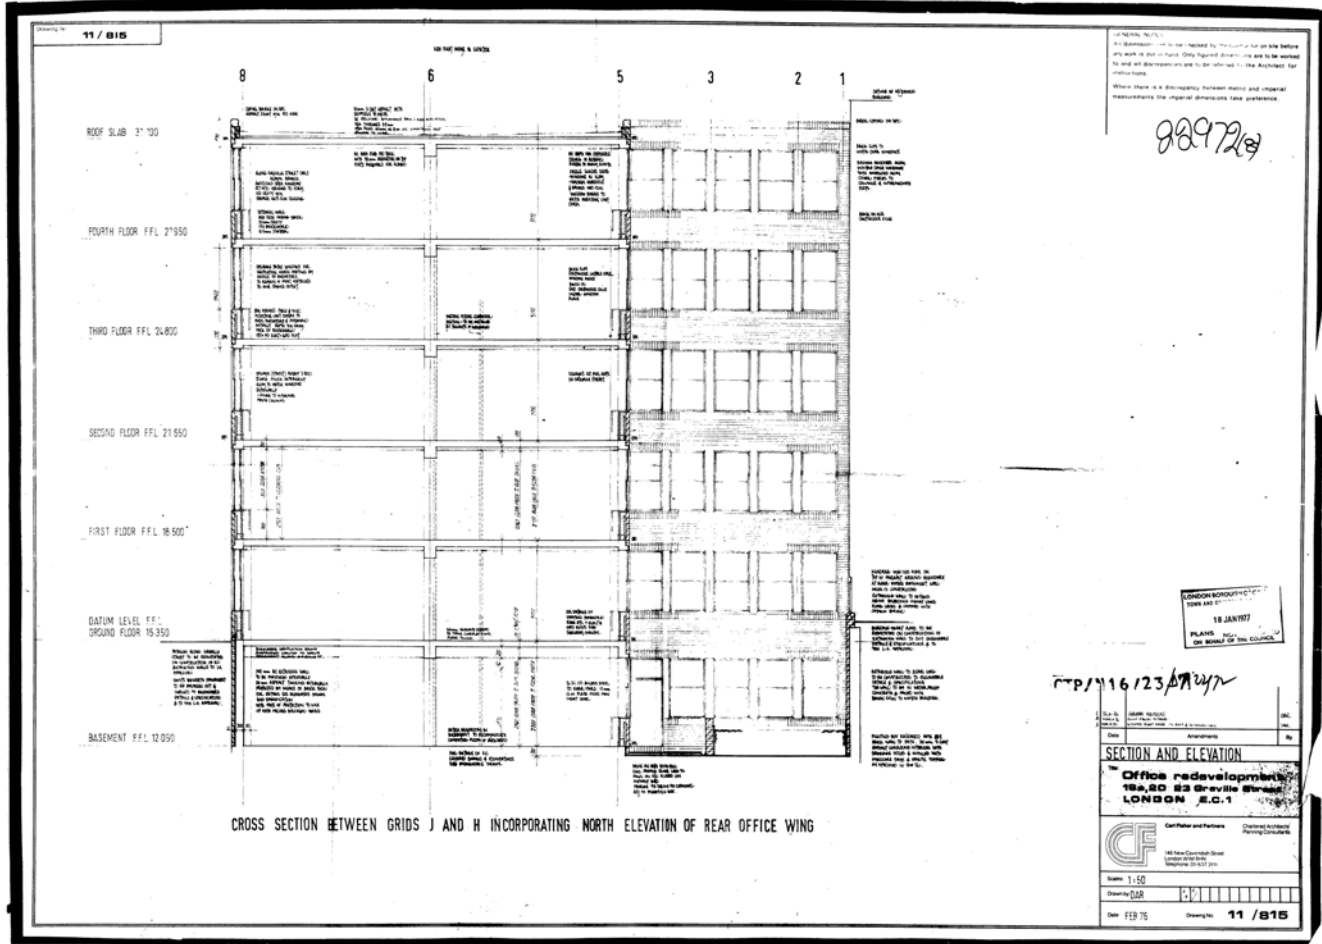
Carl Fisher and Partners, Short Section, 1976.
